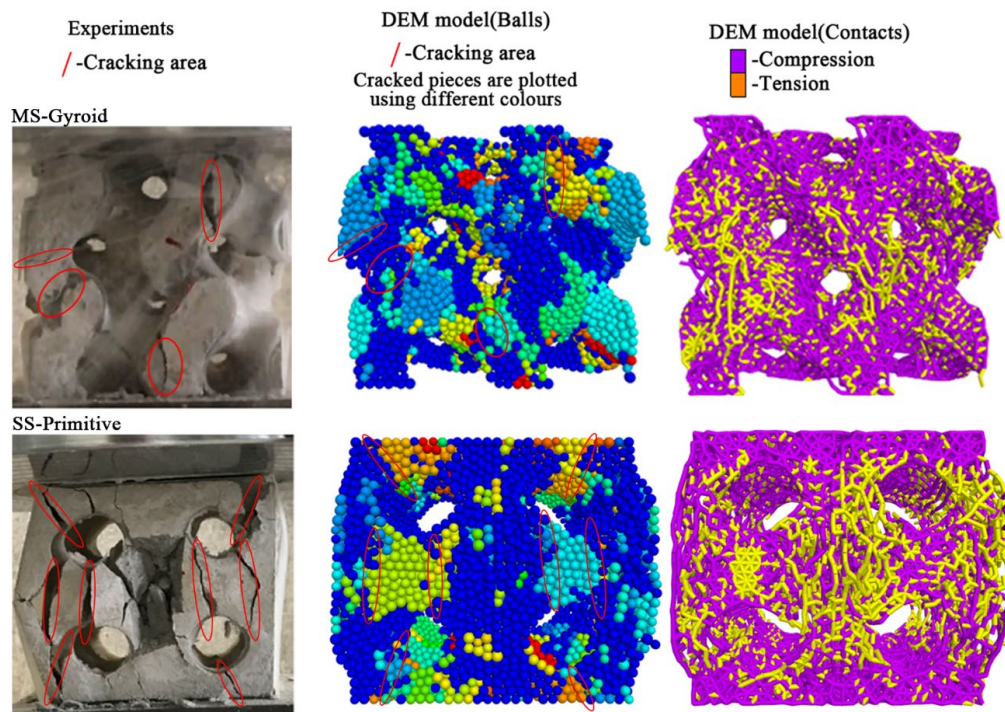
Cracked concrete TPMS structures. Images are from test and DEM numerical simulations.
